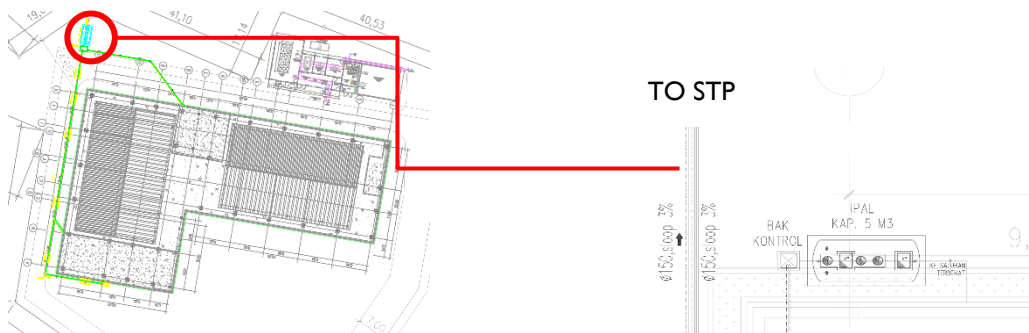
Existing Wastewater Installation Plan for Laboratory Use (on 1st Floor only)
